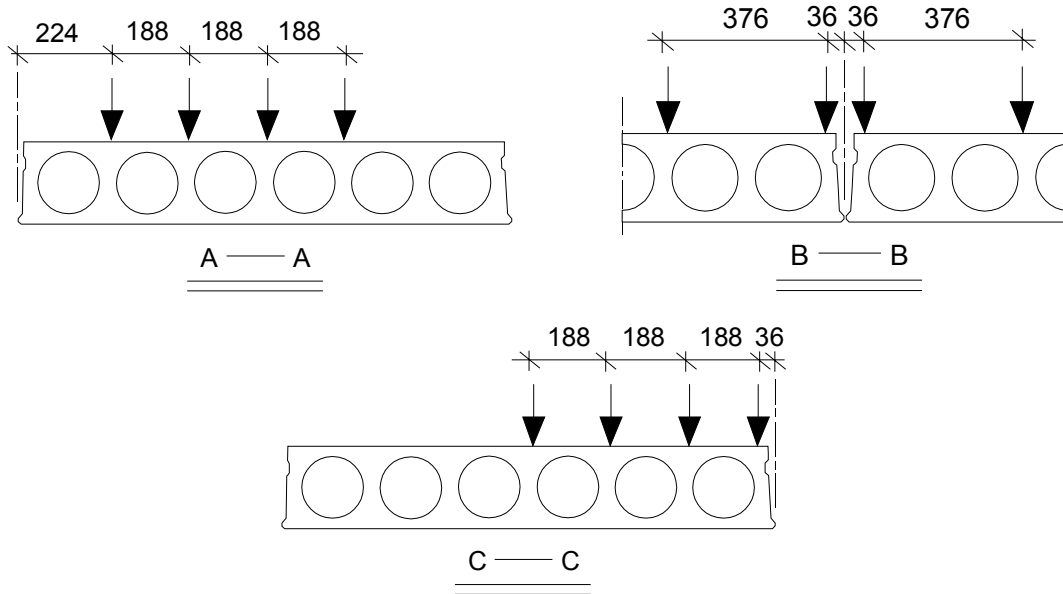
Loads in different tests. Sections A-A, B-B and C-C, see Figs 9-10.
